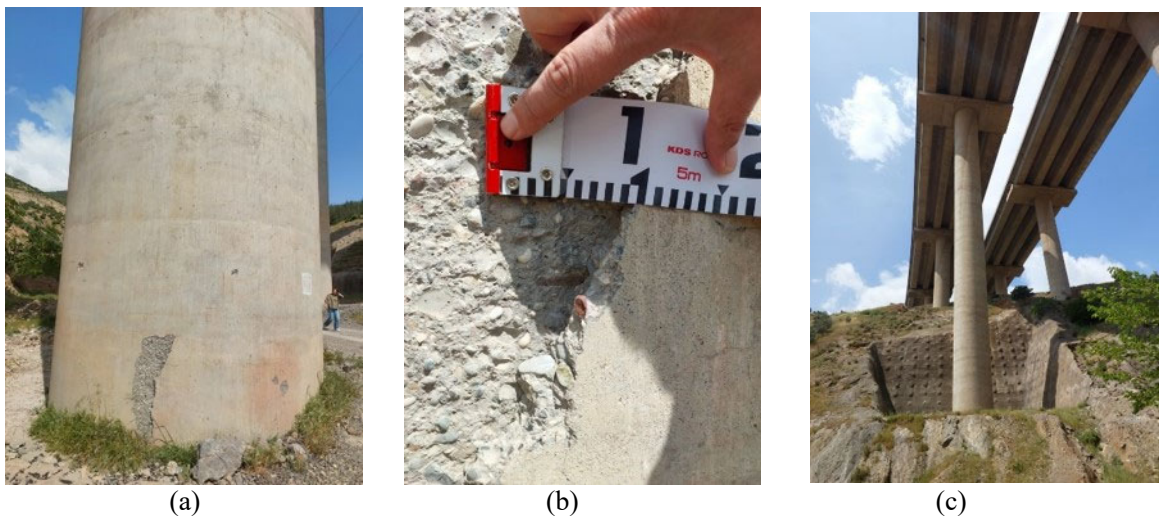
Spalling of column cover during the earthquake and detailed view Spalling of column cover during the earthquake.
